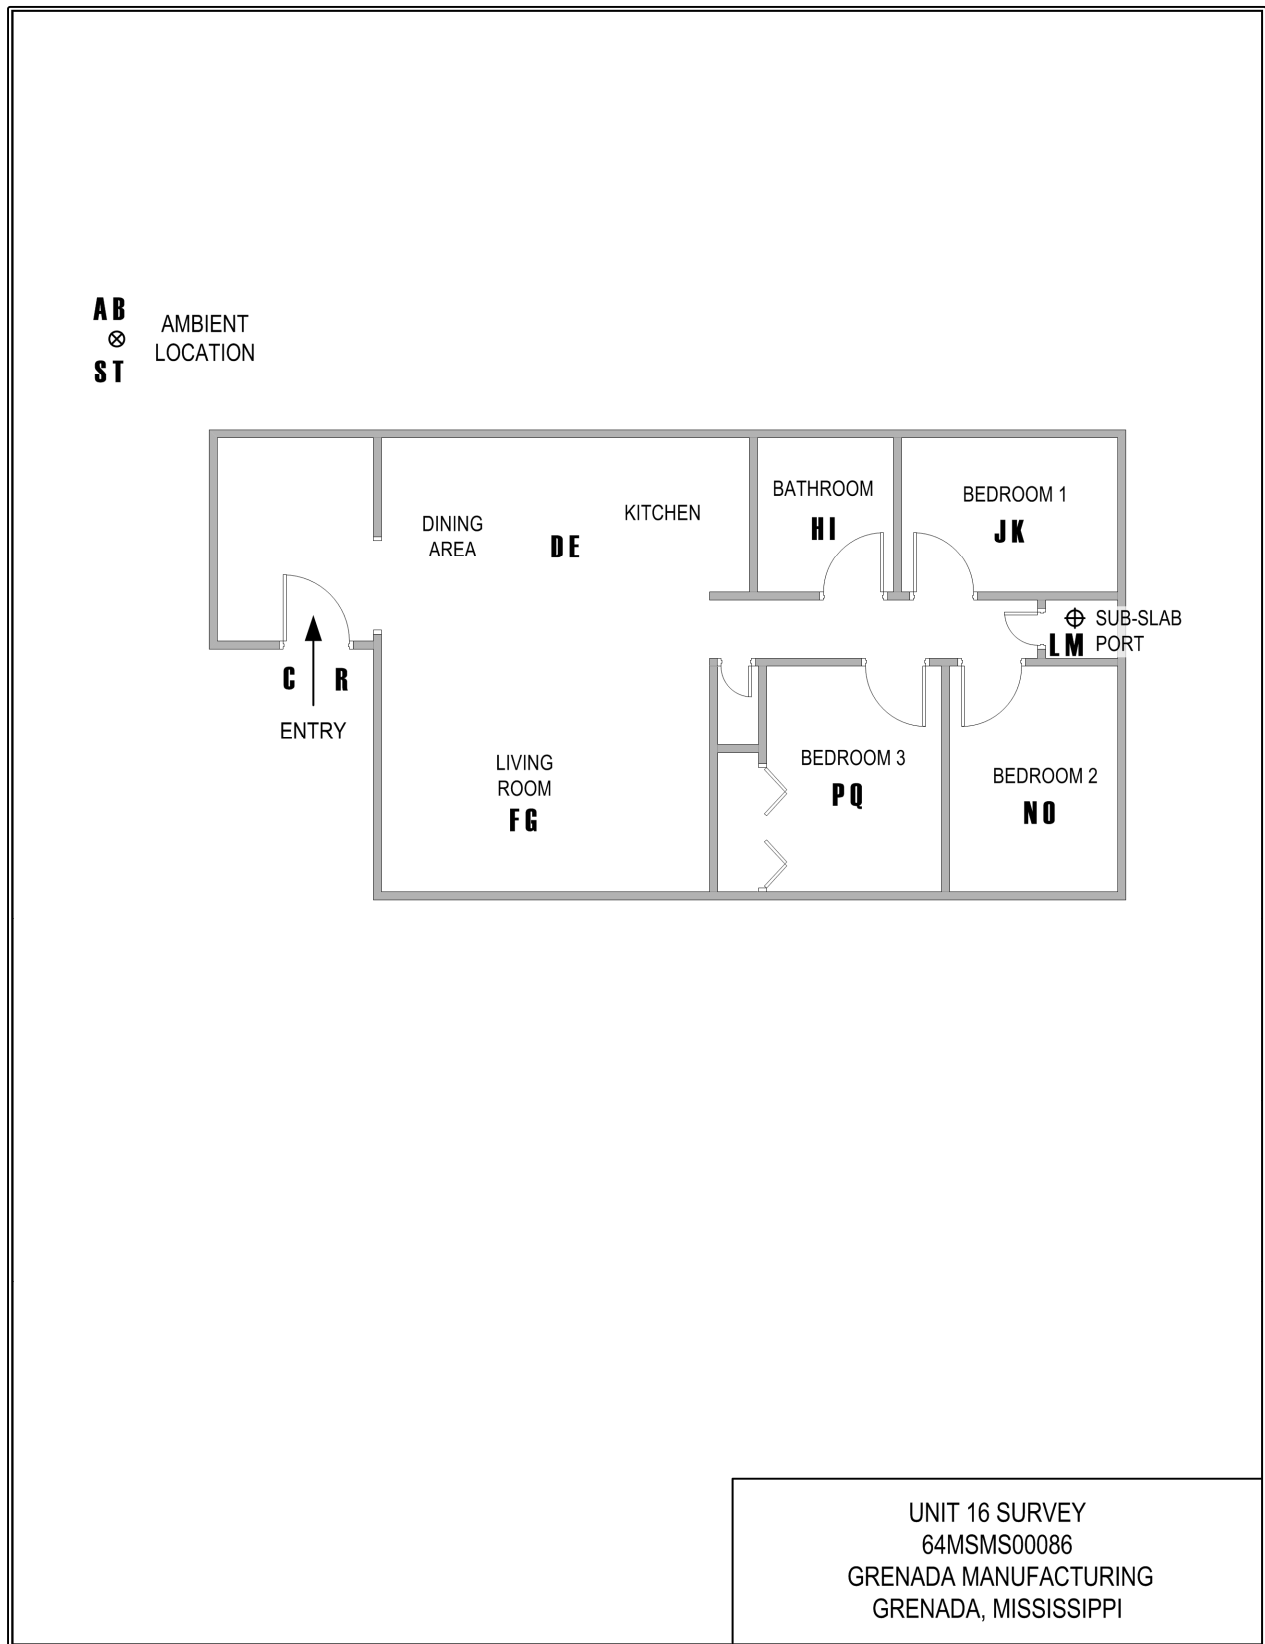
Unit 16 Survey Floor Plan, 64MSMS00086
